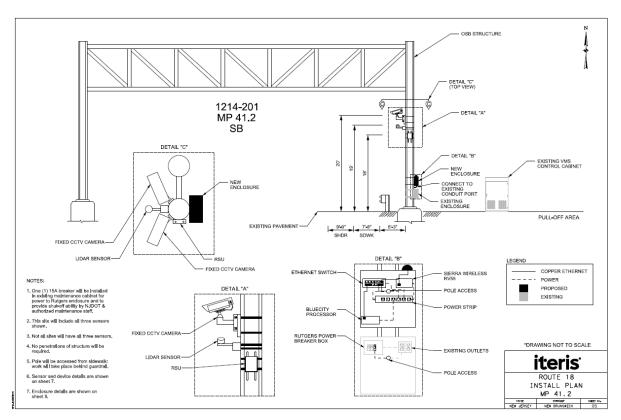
Instrumentation Drawing at Route 18 - VMS Sign Bridge
